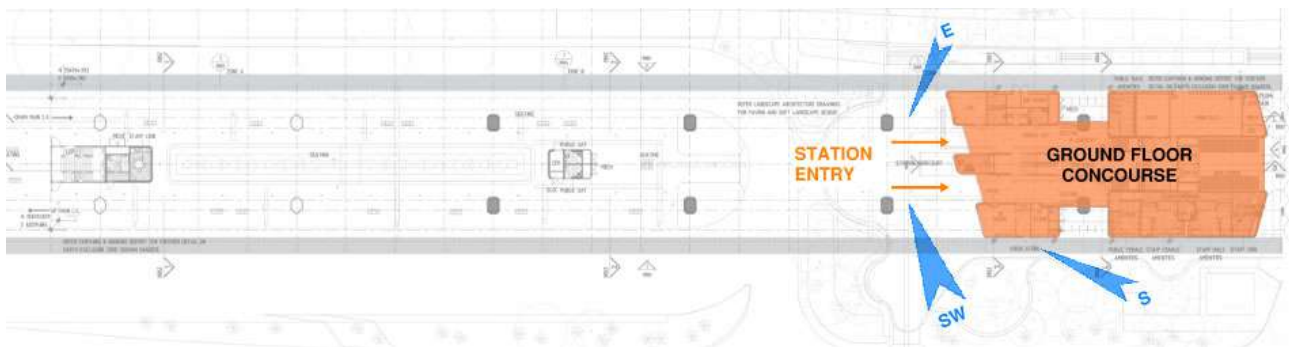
PREVAILING WIND DIRECTIONS ON GROUND FLOOR CONCOURSE LEVEL
